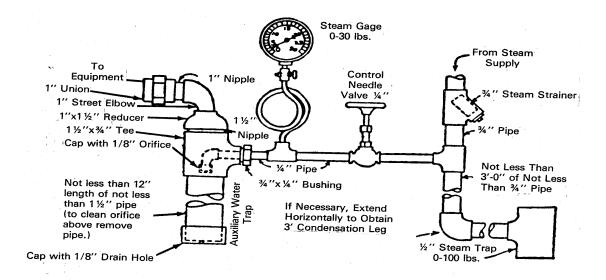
Culinary Steam Piping Assembly for Airspace Heating or Defoaming
